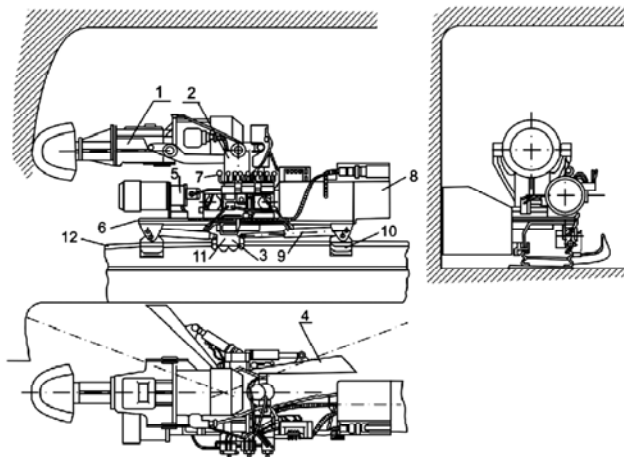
The excavating machine-manipulator VMF-4HA: 1 – arrowed executive; 2 – pivoting device; 3 – movement mechanism; 4 – loading device; 5 – electric motor with oil station; 6 – frame; 7 – the control panel; 8 – magnetic station; 9 – support-feeding mechanism for the capture of feed jacks; 10 – downhole ski; 11 – hydraulic gripping; 12 – round guide
